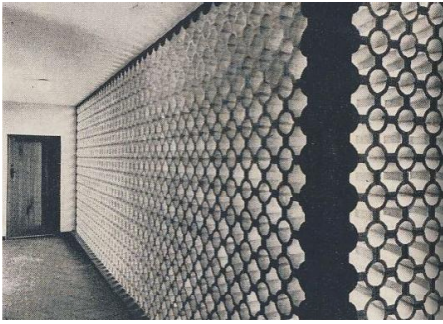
Brisoles evident on the rear elevation for ventilation and shading (Source- Benjamin & Crofton: 1958, 38)
